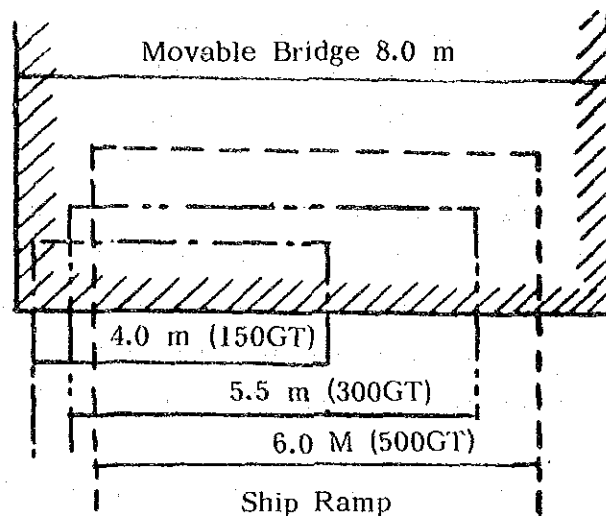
Width of Movable Bridge of 500 GT Ferry
